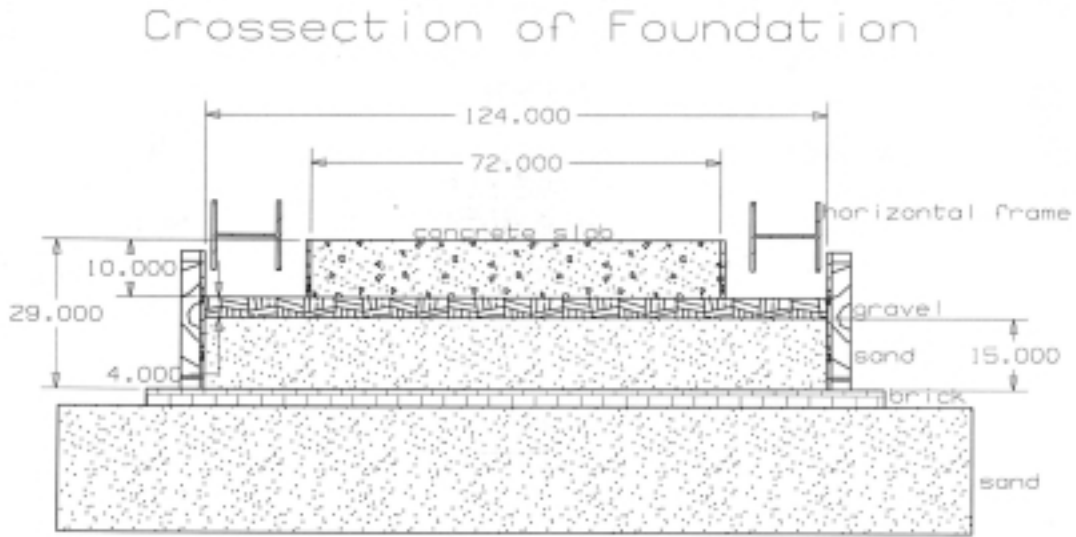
shows a cross section view of the slab testing facility. The slab was connected to a horizontal reaction frame at each end through twelve 30-mm threaded steel rods. The slab could be subjected to horizontal loading and displacement through the dowel connections. The vertical load, simulating  $\frac{1}{2}$  ESAL, was applied at the midslab. The maximum load applied was 40 kN over a 300-mm circular plate.
